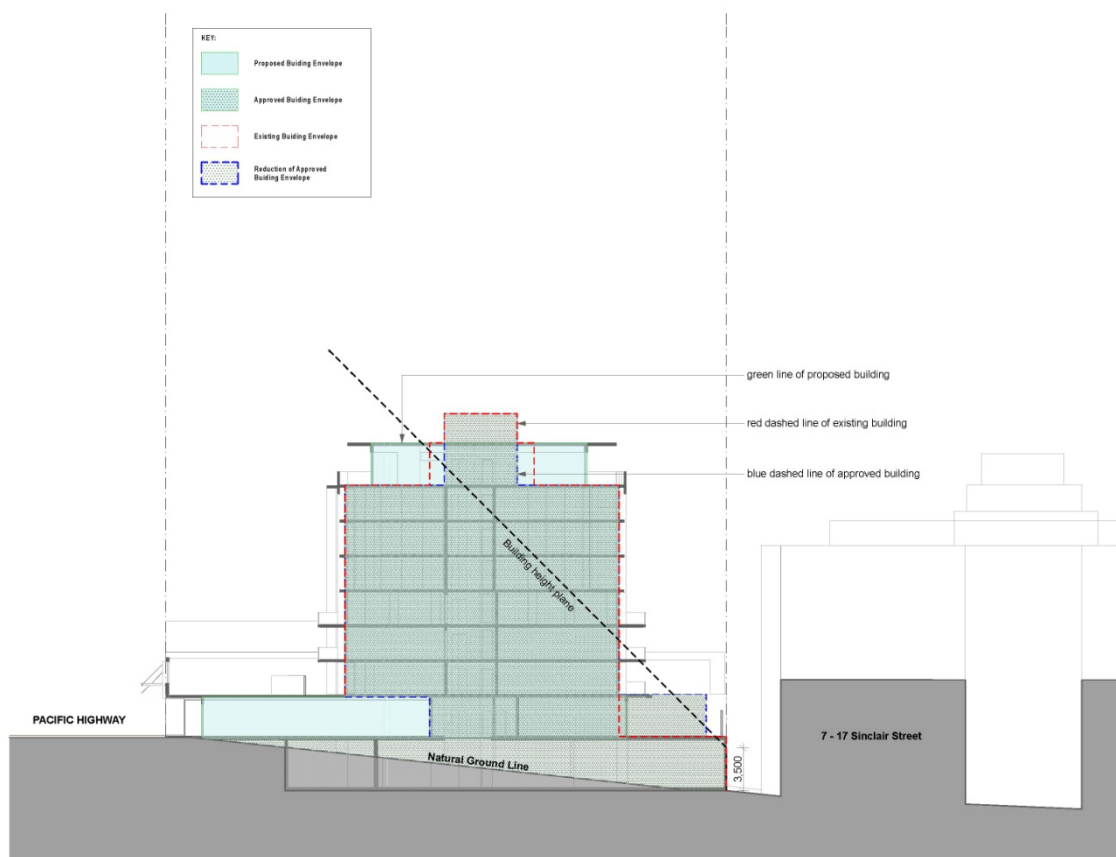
Figure D - Building 2 BHP (Cl. 30(2) (c)) compliance plan (existing, approved/commenced & proposed) (Source JPRA)
